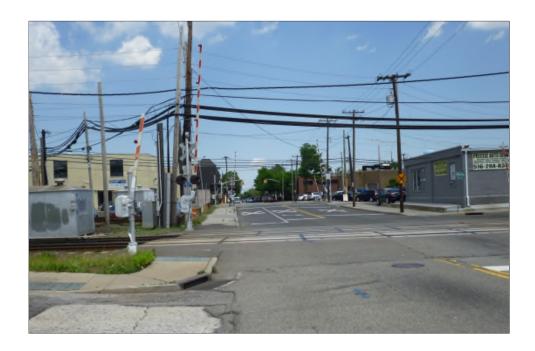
Willis Avenue grade crossing looking south across Main Line (foreground) and Oyster Bay Branch (background) crossings. Subsurface utilities noted include water, sewer, stormwater, and electric.
